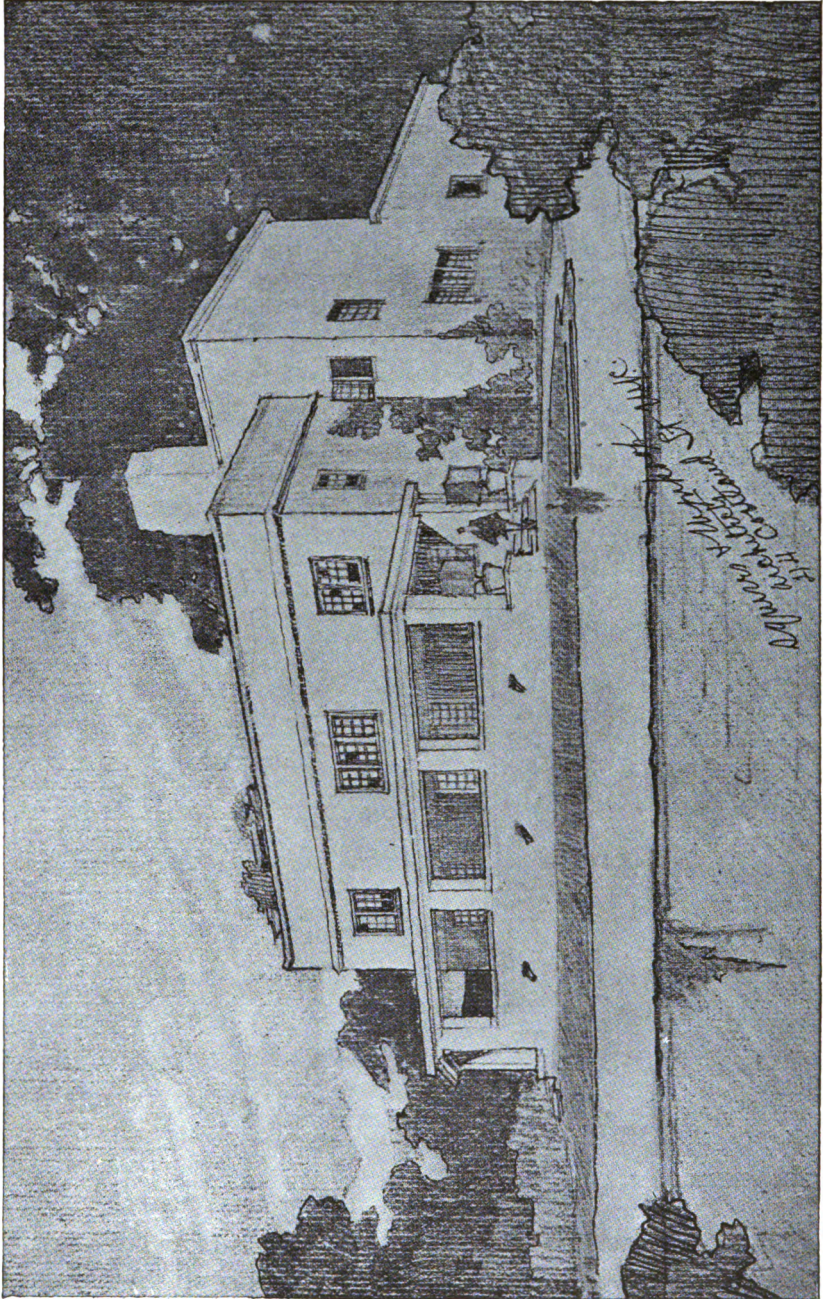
A Concrete Block House at Lake George, Rath Artistic
